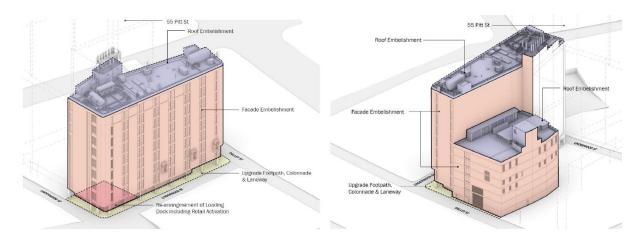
Proposed scope of works to existing Telstra and Ausgrid utility buildings
